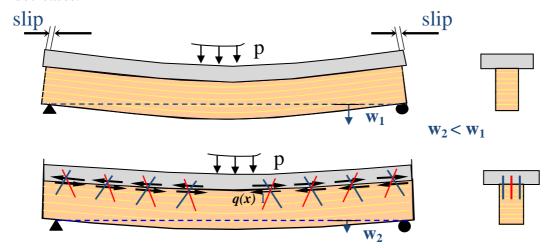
The principle of joining a timber beam and a concrete slab using glued-in steel bars.
